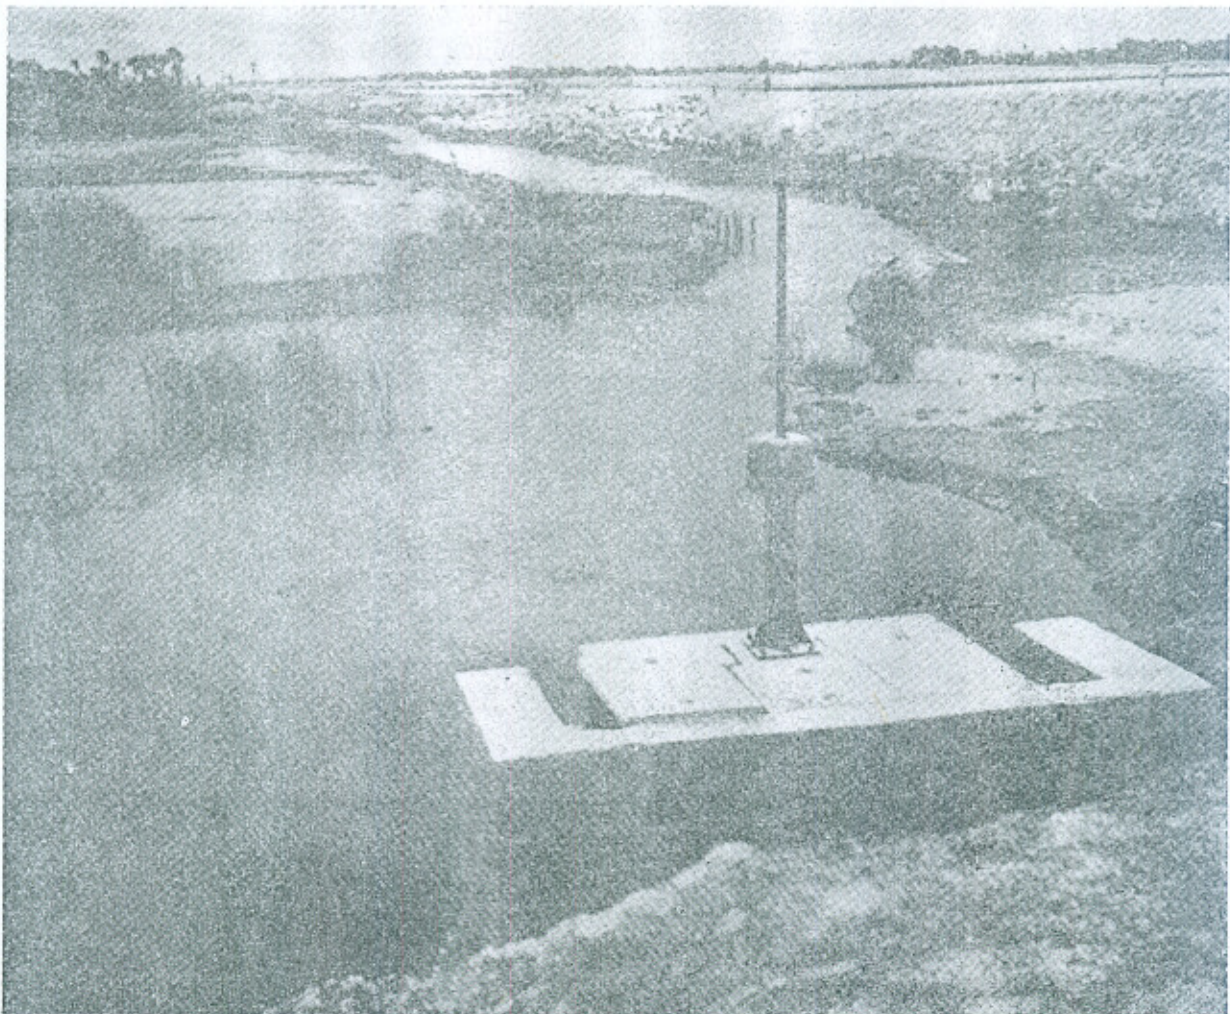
Downstream end of the Gated Drainage culvert constructed under Sanawan Flood Bund to drain the excessive seepage water in the head reach.
